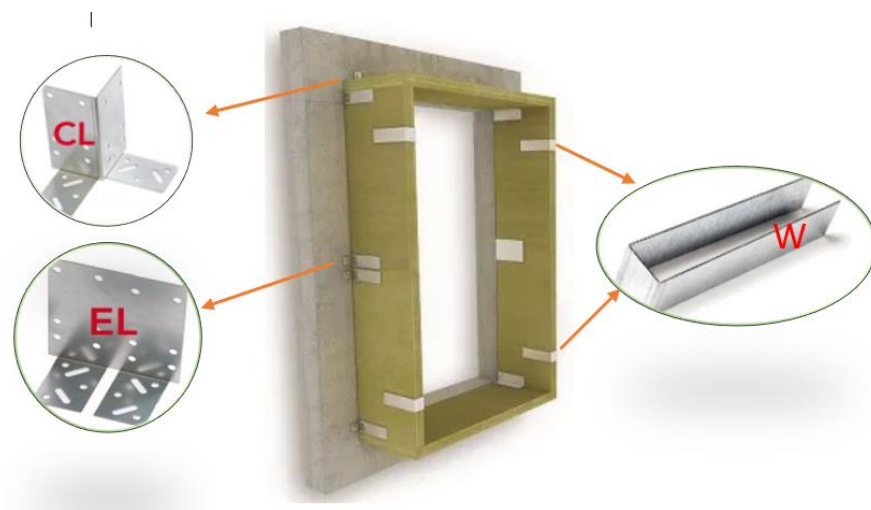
System of window installation in the insulation layer using the stone wool boards (SWB) REDAir TM LINK [33].
